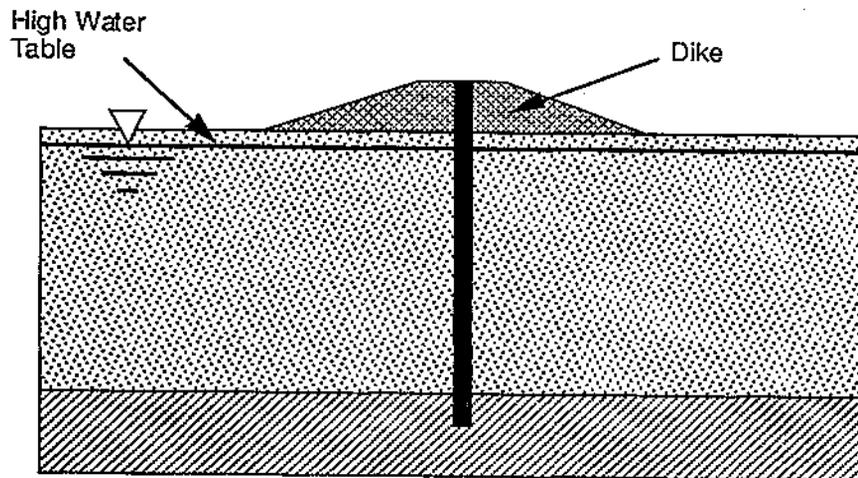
Construction of Dike to Raise Ground Surface for Construction of Slurry Trench.
